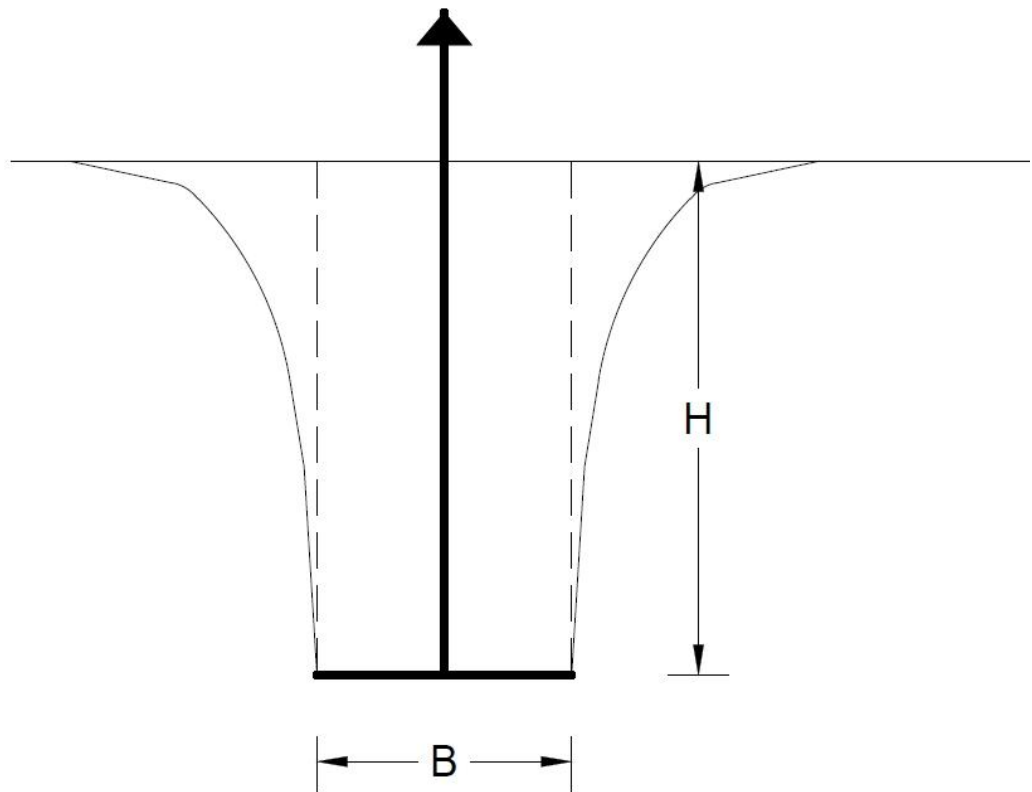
Failure surface assumed (adapted from: Meyerhof and Adams, 1996)
